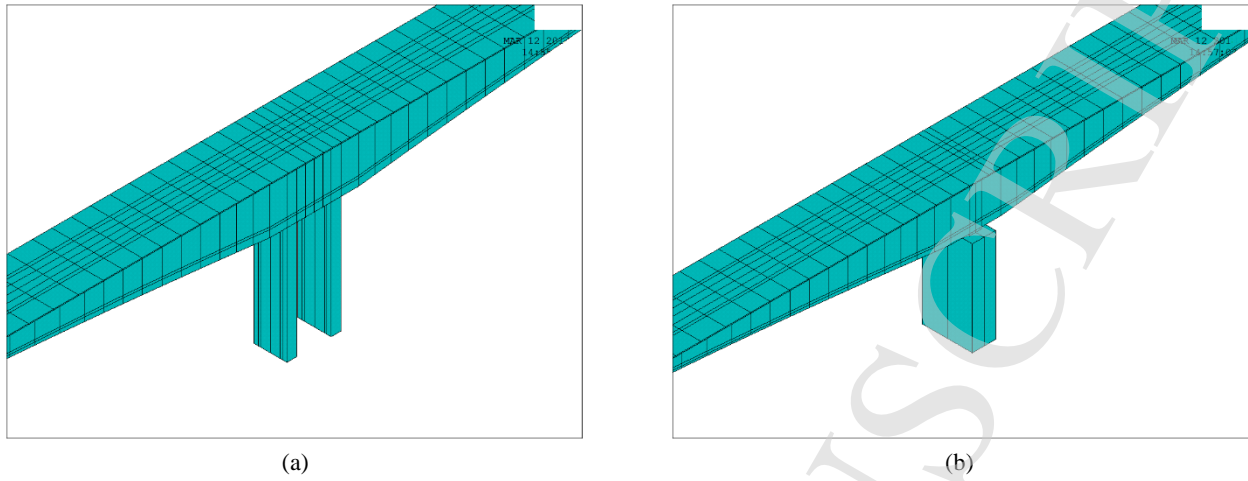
Models of the bridge piers: (a) Rigid pier, (b) Non-rigid pier
